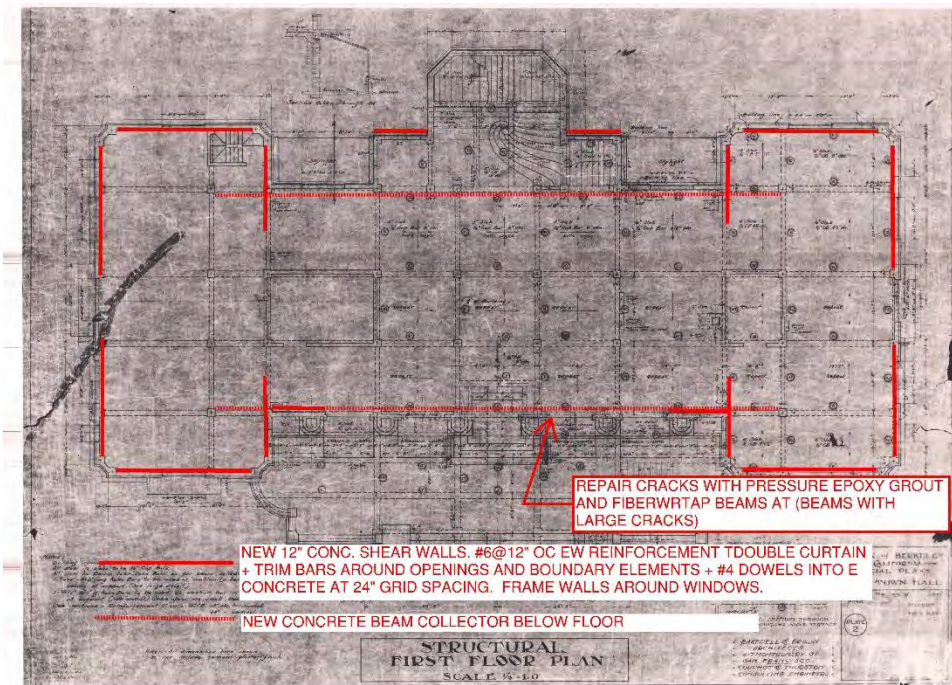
Seismic Retrofit Scheme (Concrete Shear Walls) at First Floor
